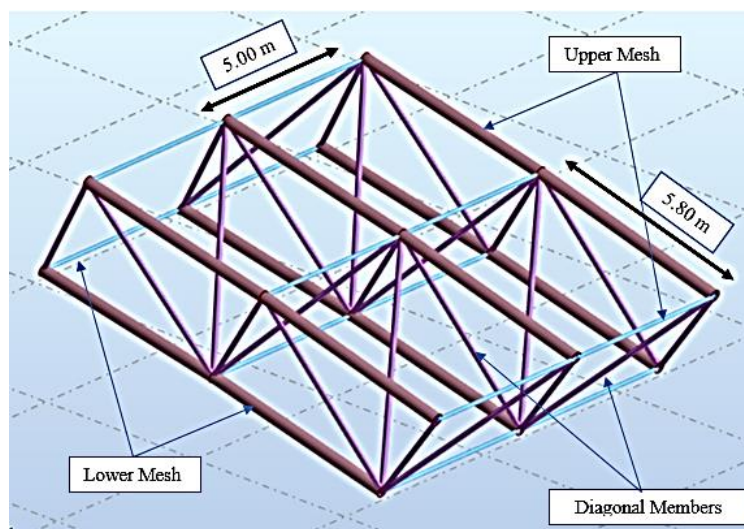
Layout and arrangement of panel's space truss: spacing between upper mesh members which supported the fabric membrane.
